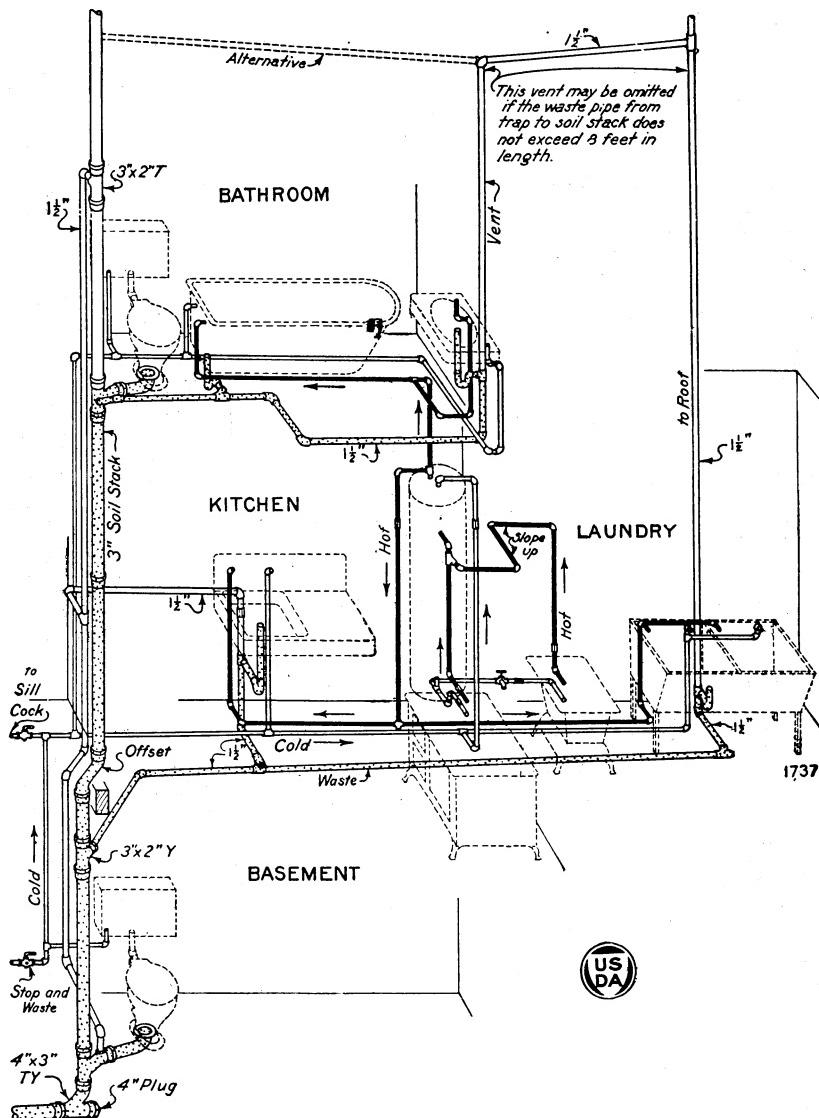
Roughing-in the drainage and water pipes for a two-story house with water-closet in the basement and laundry in a rear room. Drainage pipes are stippled, hot-water pipes are in black and cold water and vent pipes are outlined
